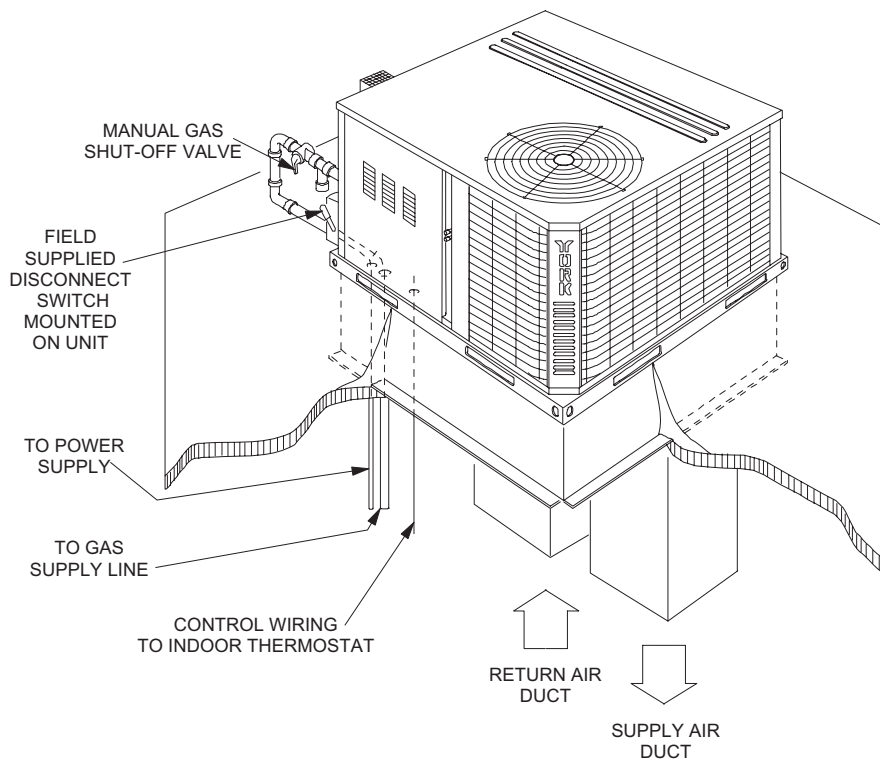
TYPICAL ROOF CURB INSTALLATION
